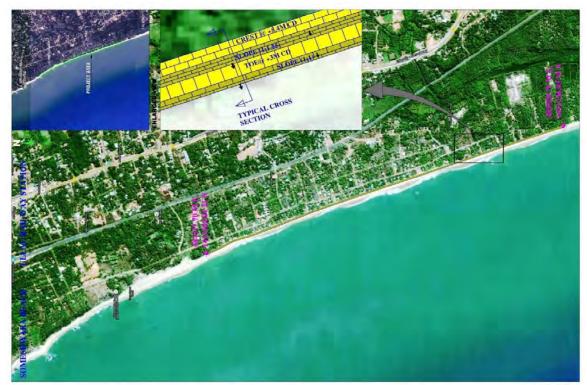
Layout of Proposed Geotextile Revetment at Someshwara
